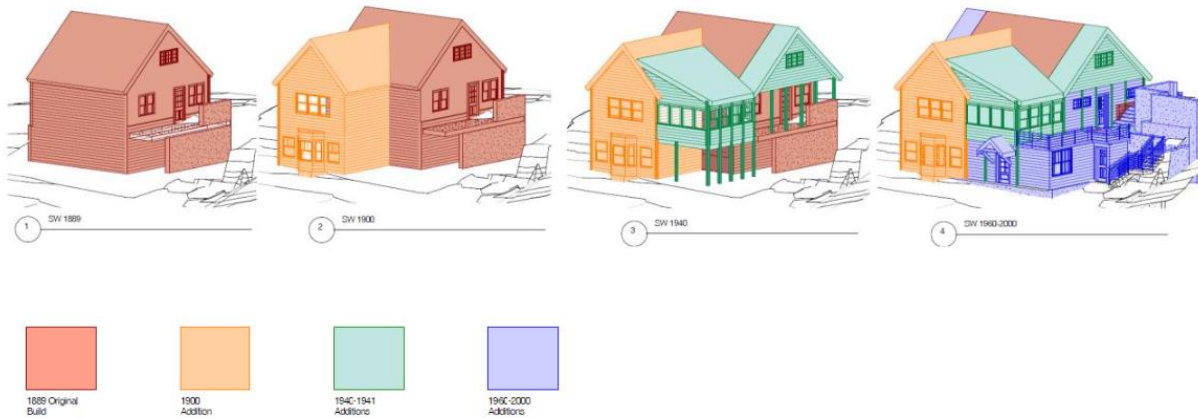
Applicant's illustration showing various additions to the Historic Structure at 218 Sandridge Road.
